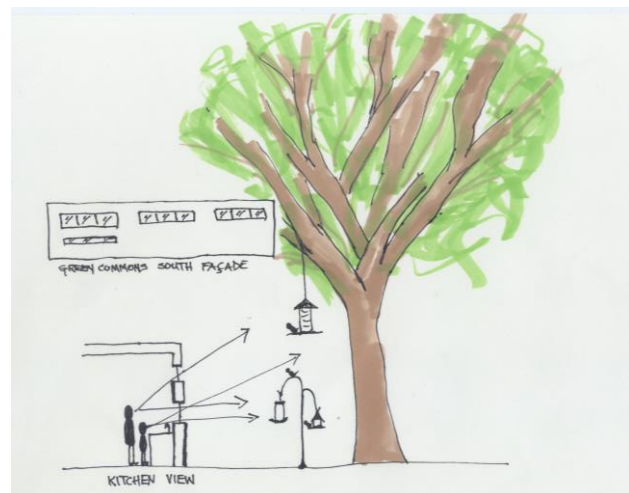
Operable clerestory windows on south façade of Green Commons offering views of tree canopy, with smaller lower windows offering views to the street. Not to scale.
